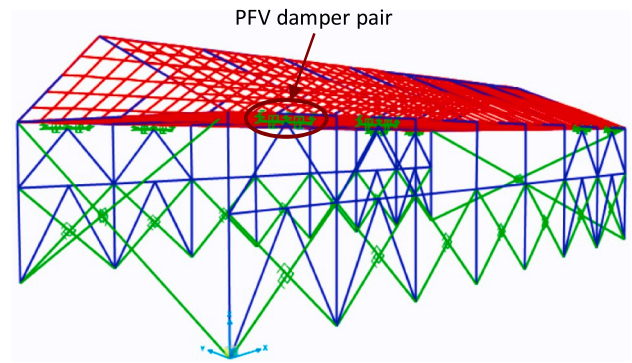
Finite element model of the structure incorporating the dissipative bracing system.
